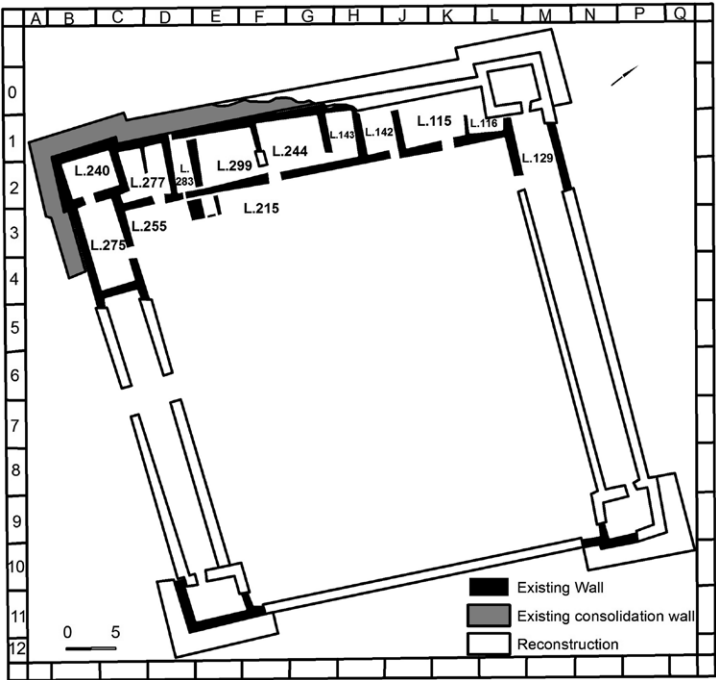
Plan of the fortified agriculture estate of Nahal Tut (Alexandre 2006: 140, plan 3).
